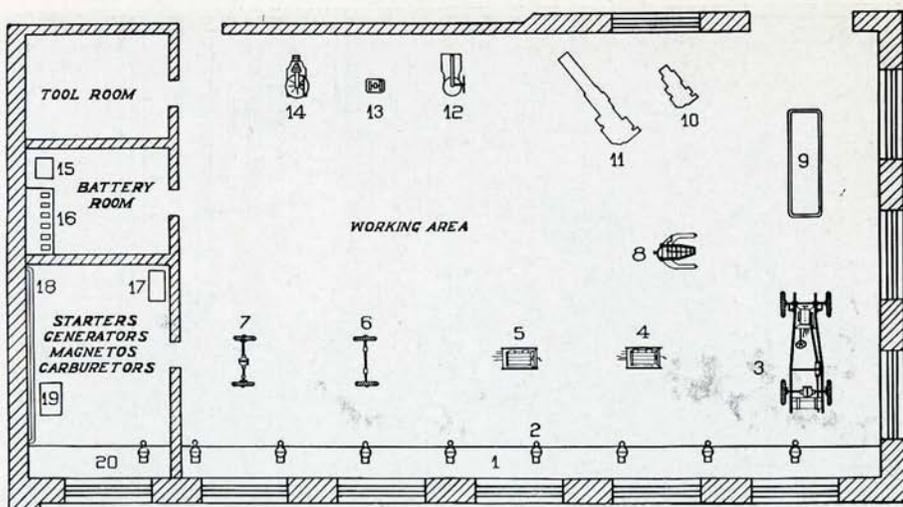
Motor Mechanics Shop Floor Plan Layout.
